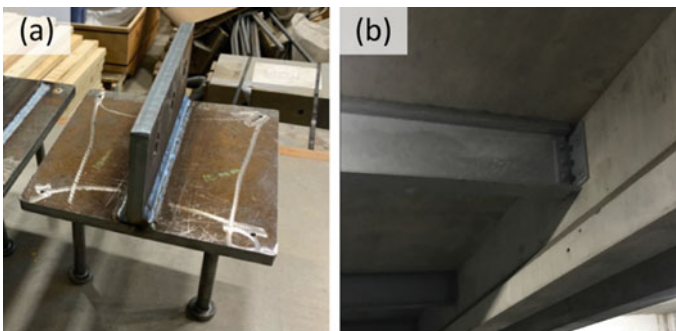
a Plate prior to concrete casting, b Post-installed anchorage on a concrete beam loaded in shear towards the free edge
